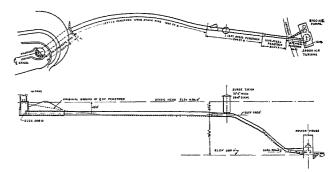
Plan and Profile of the Pipe Line and Penstock
